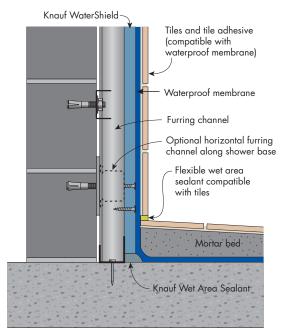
Shower Base over Masonry Wall Internal in-situ shower tray Class 3 membrane shown - Section
